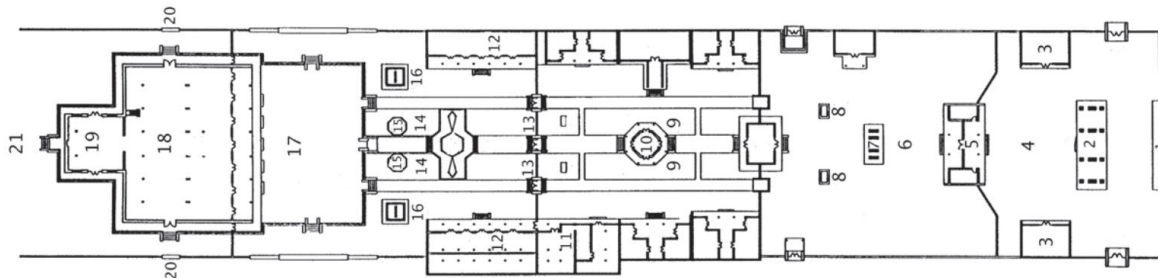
The layout of the Great Mosque of Xi’an. (1) screen wall (2) wooden pailou (3) side gate (4) first courtyard (5) gate (6) second courtyard (7) stone paifang (8) stele pavilion (9) third courtyard (10) Shengxinlou (11) hall for ablutions (12) lecture hall
